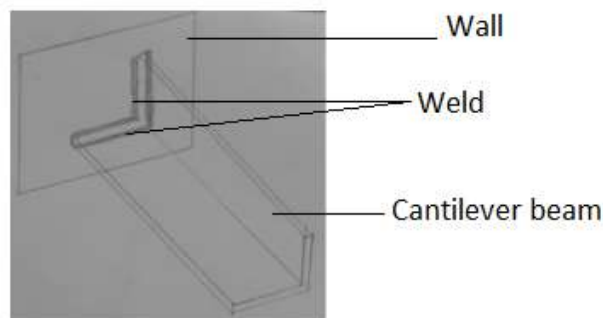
Weld joint at the fixed end of the cantilever beam
